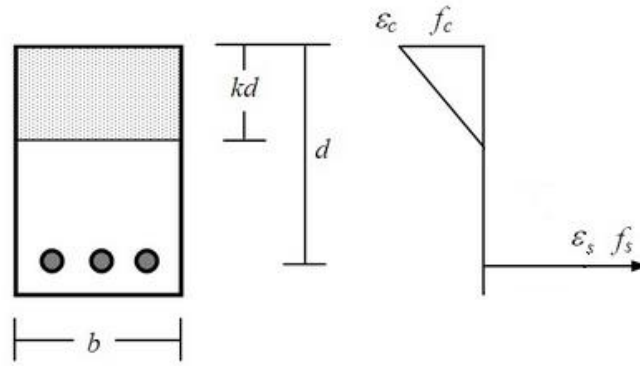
Stress distribution in a reinforced concrete section at service load [42]
